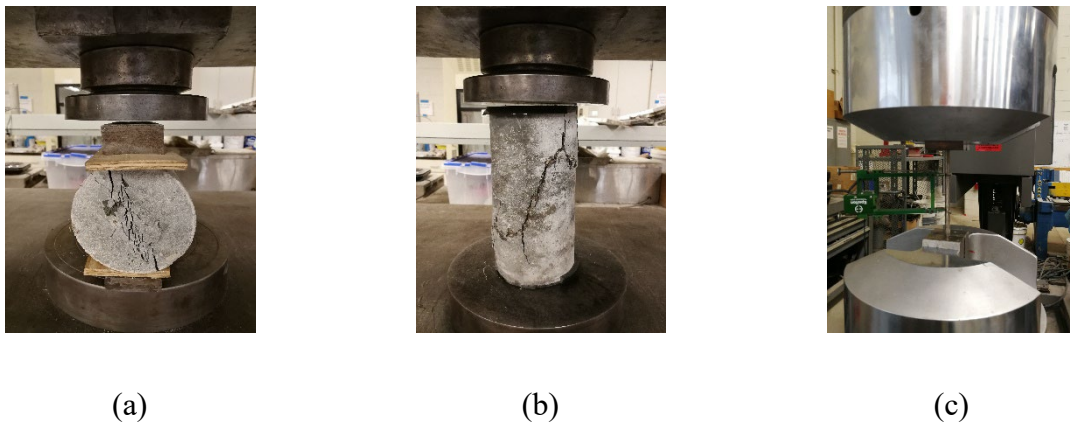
Experimental setups for (a) concrete splitting test, (b) concrete compressive test, and (c) steel bar tension test
